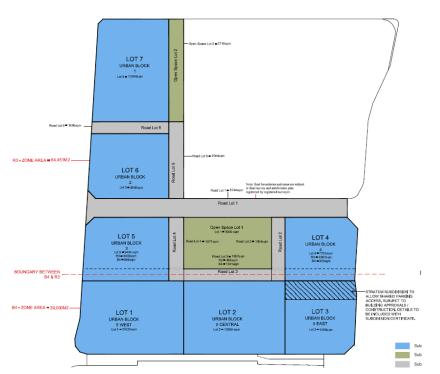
Approved Master plan concept subdivision plan DA-14/96
